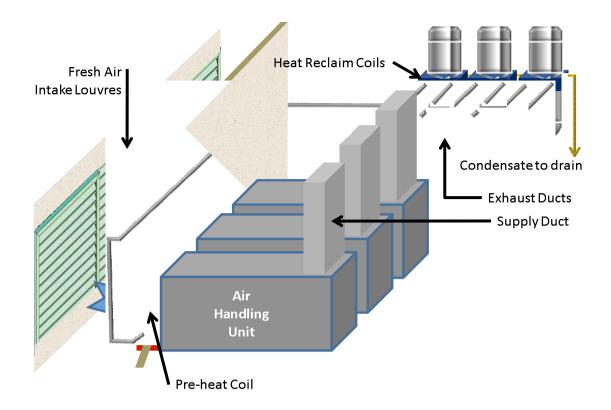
Laboratory Exhaust Air Heat Reclaim
